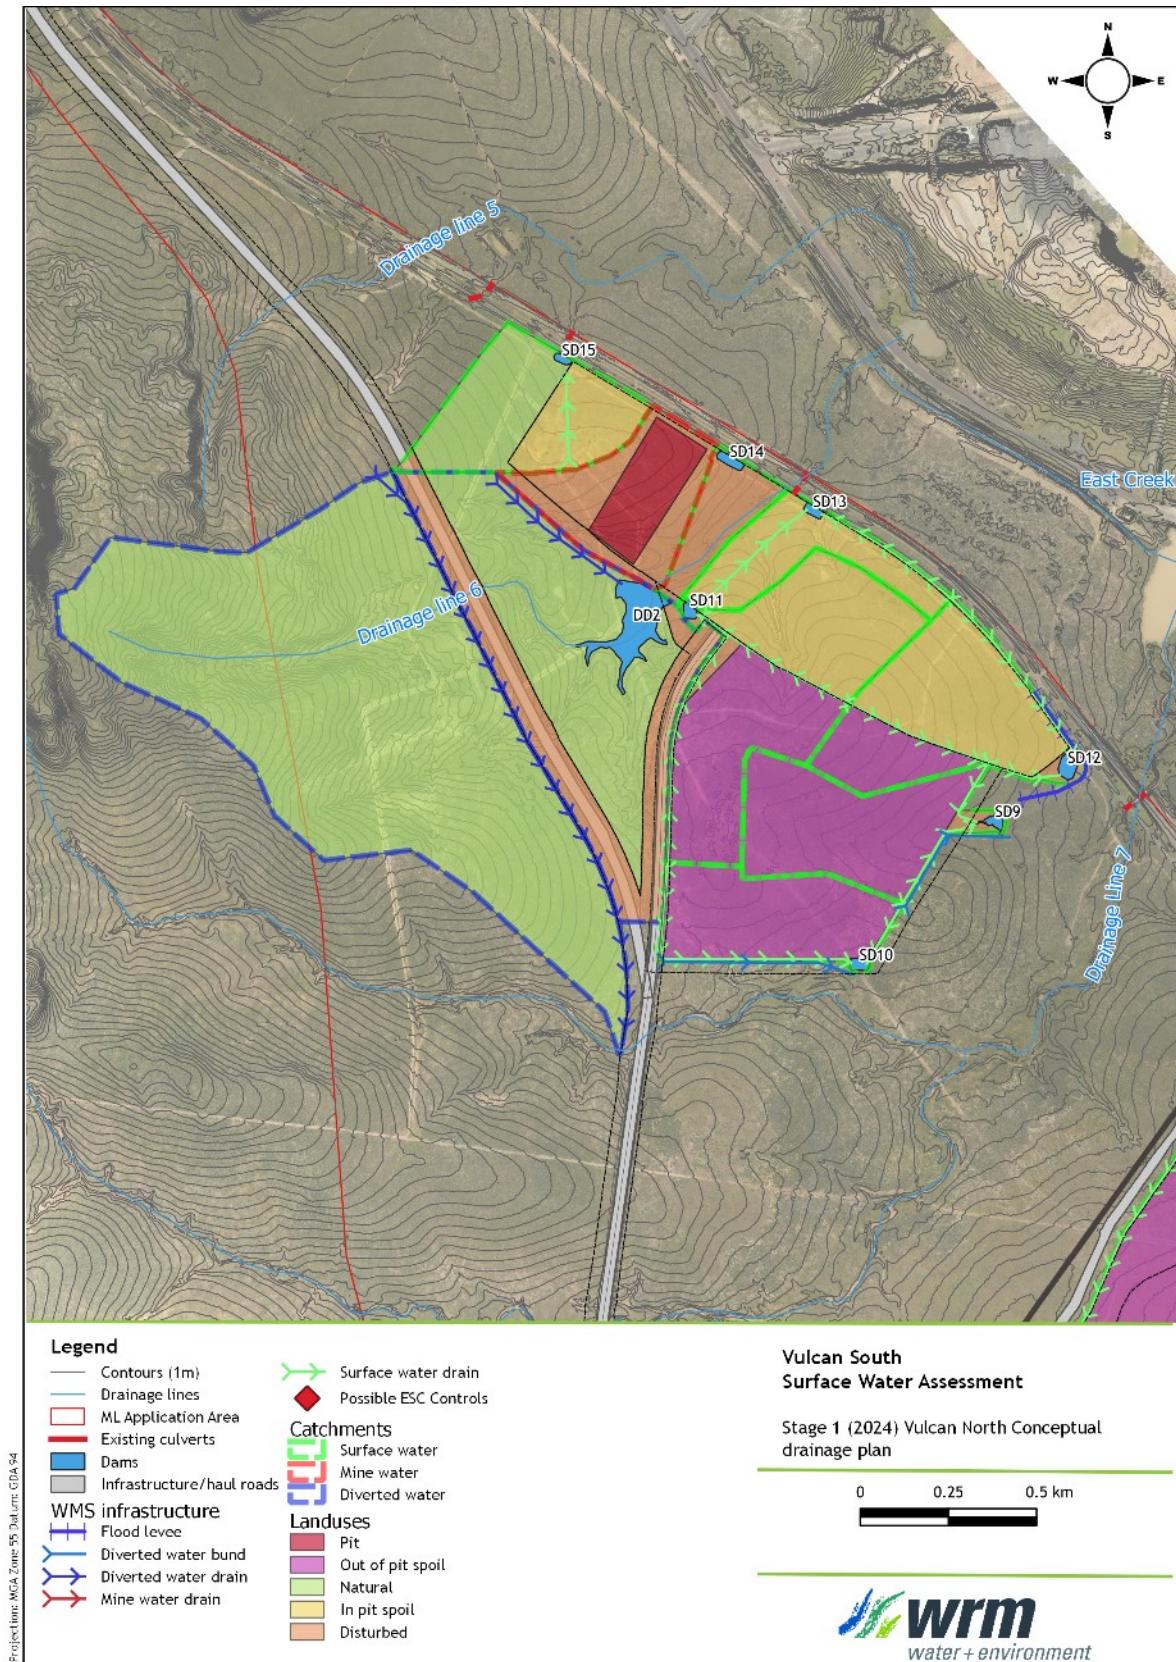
Stage 1 (Year 2024) Vulcan North mining area conceptual drainage plan
